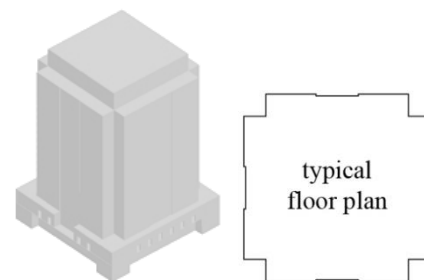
Three dimensional and typical floor plan of the investigated highrise building
